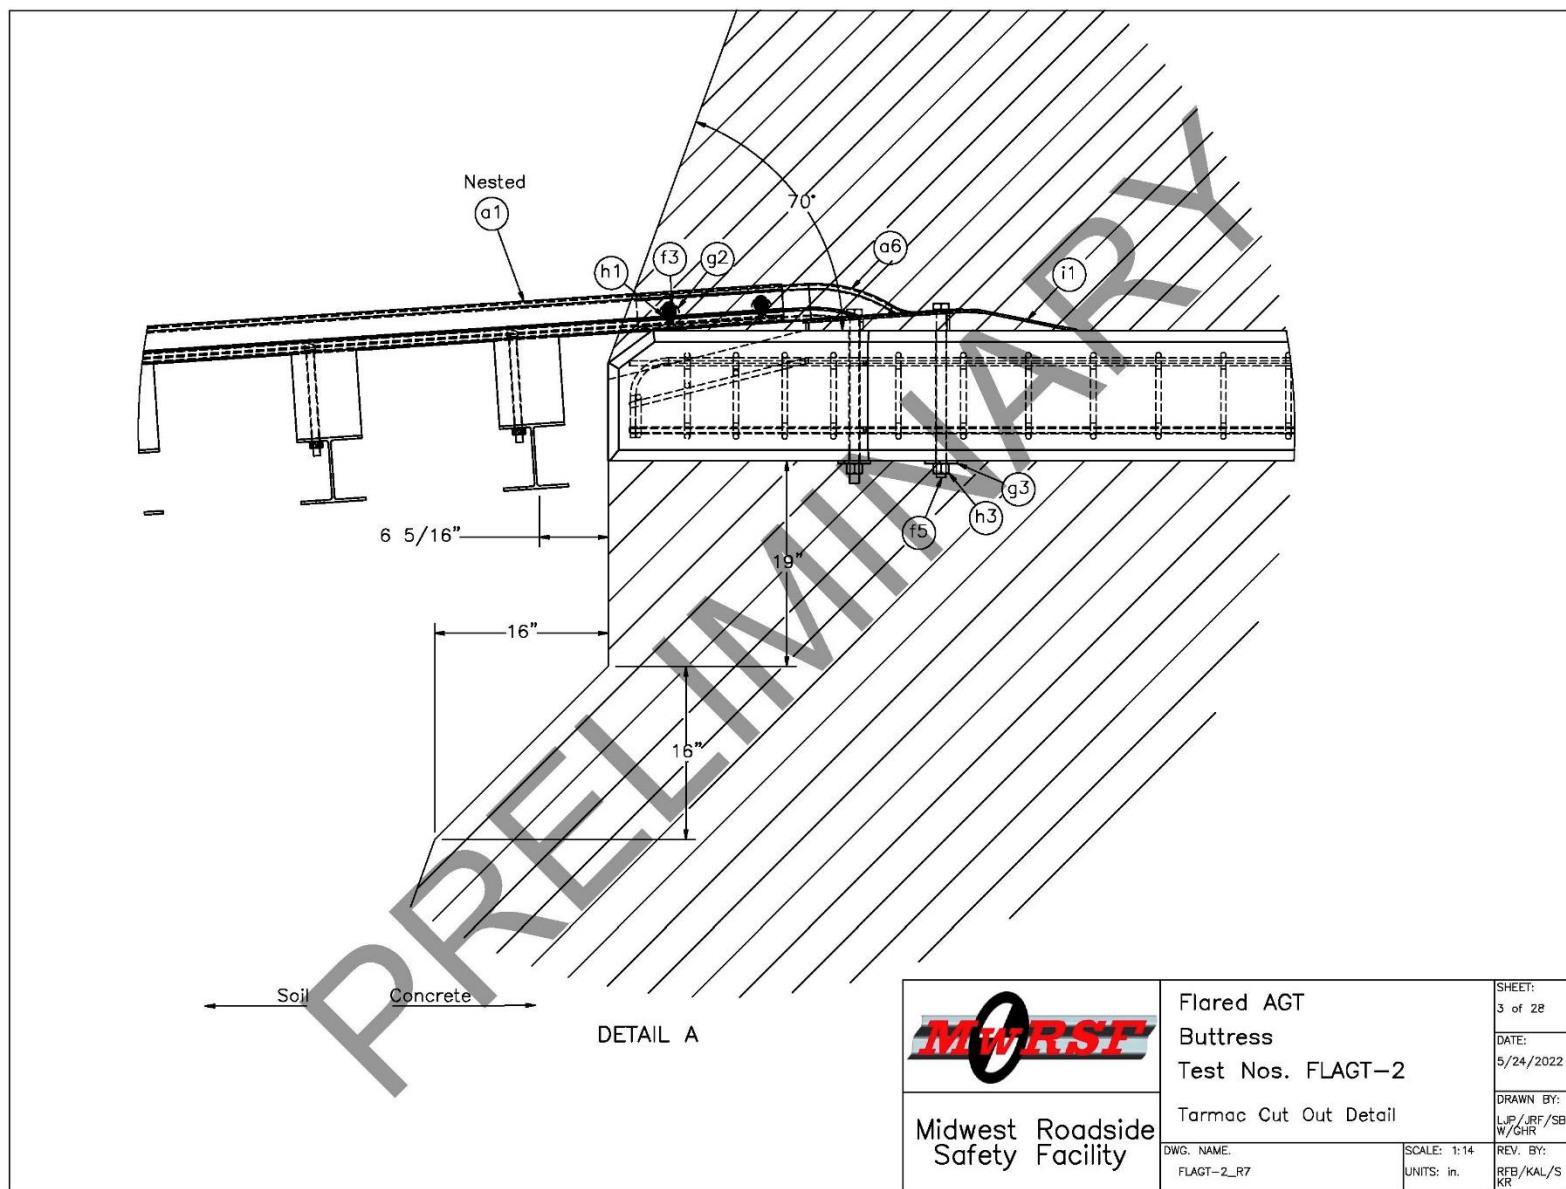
Tarmac Cut Out Detail, Test No. FLAGT-2
